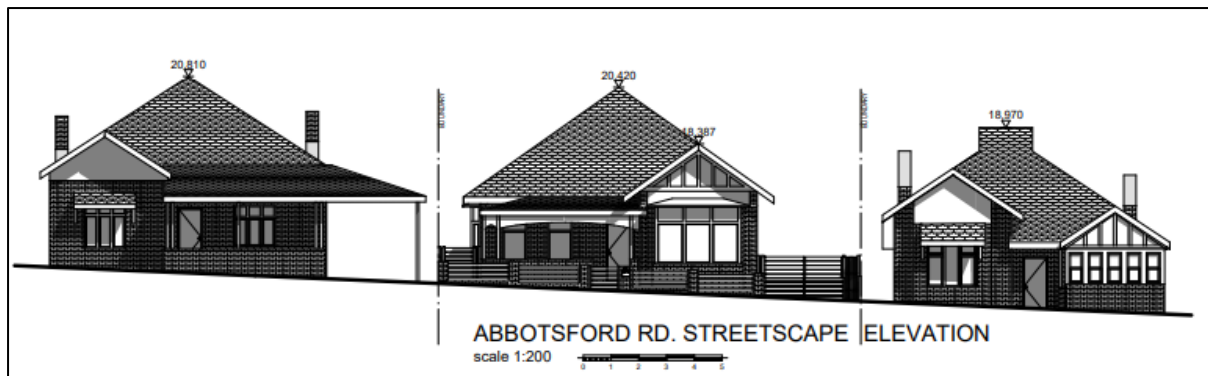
Streetscape elevation of proposed development demonstrating how the building rhythm has been retained.
